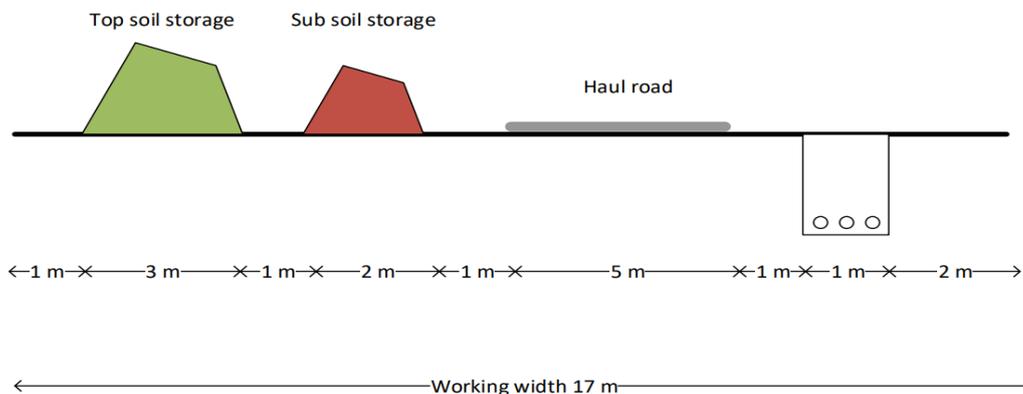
Working Corridor for Cables (source: WSP | not to scale)
